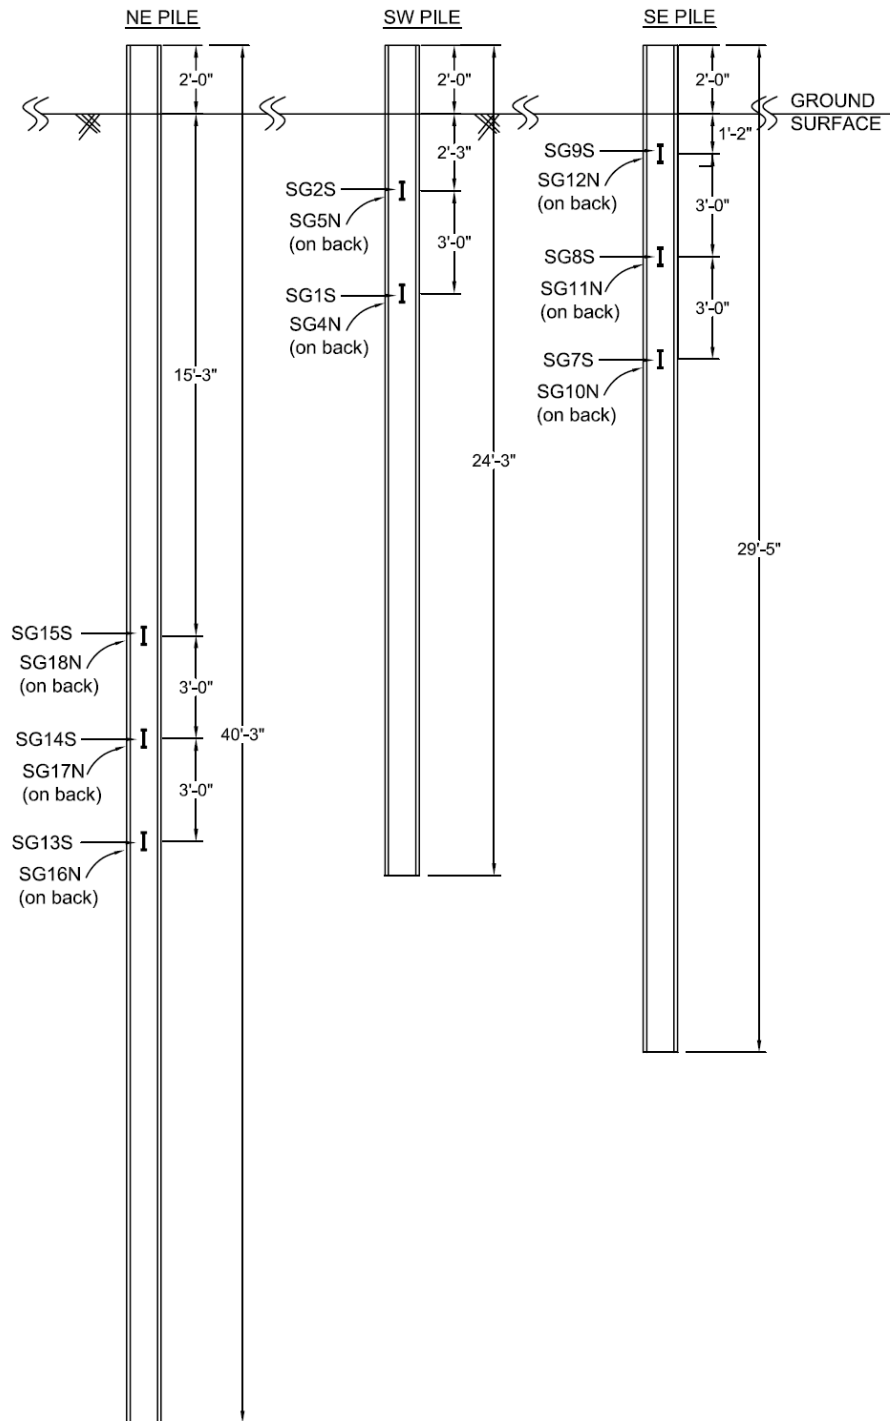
Strain Gage Depths for Instrumented Abutment Piles (after Hanlon, 2010)
